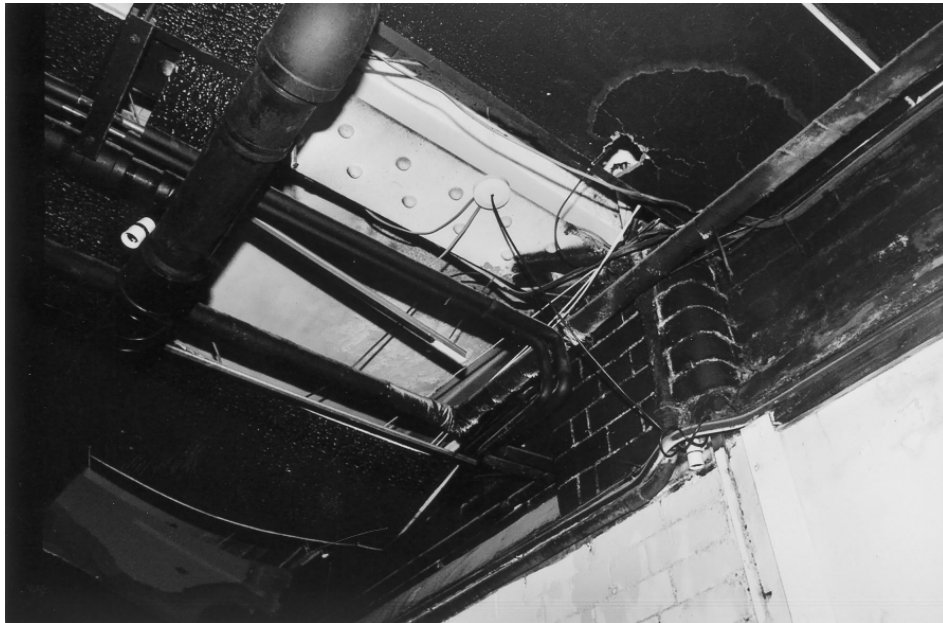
Room 7, warehouse. Brick buttress on north wall of 1901 basements joined by steel girder from 1905 warehouse.
